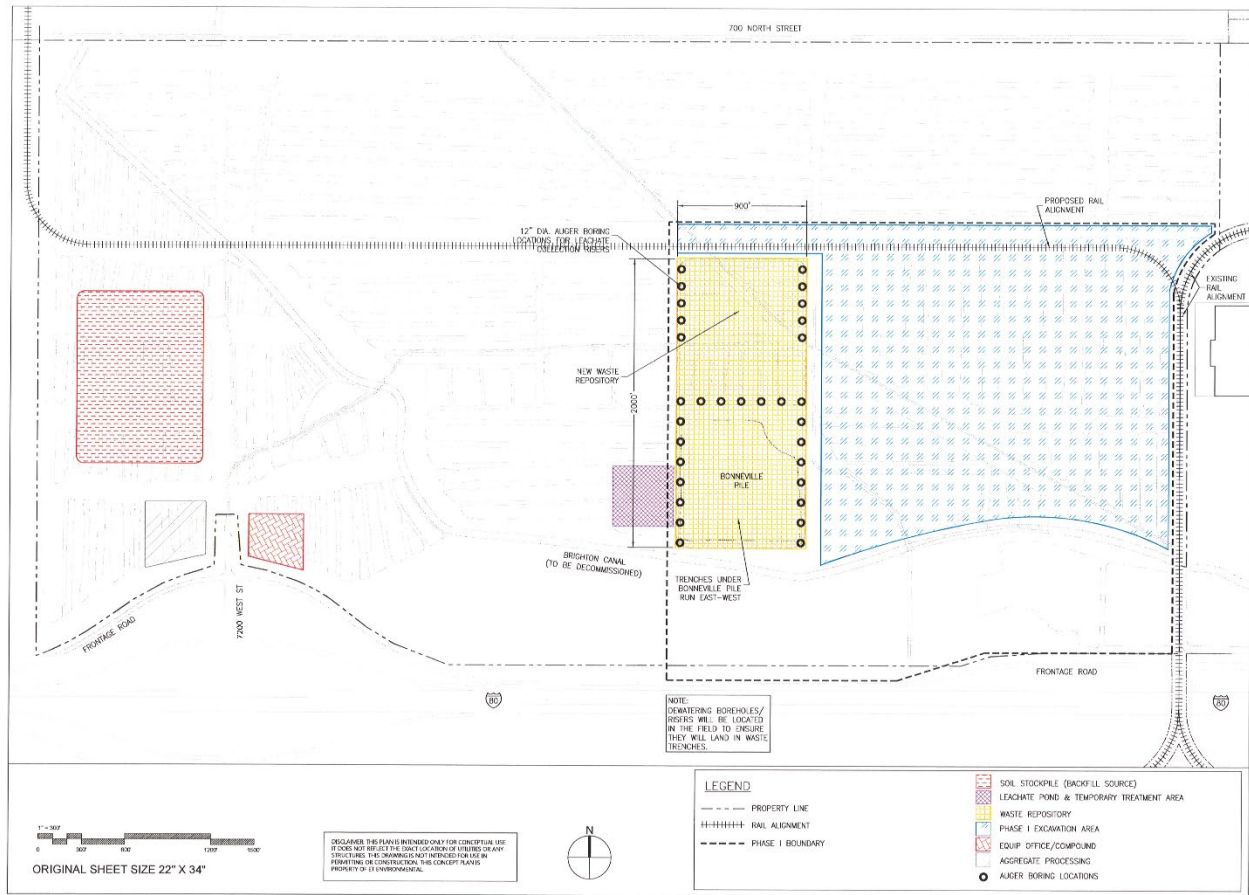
Leachate Dewatering Plan (See Also Appendix A-16)
